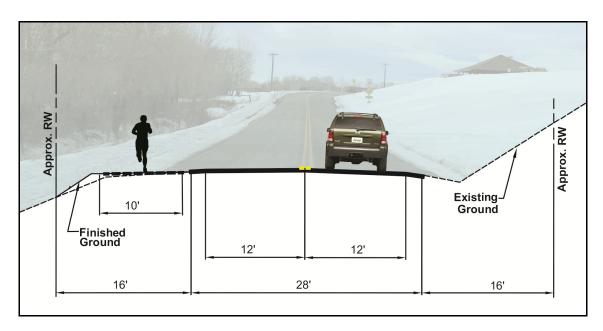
Lower section of McIlhattan Road looking west (typical section N1-d) showing Bridger Creek Golf Course club house on the right and creek on the left
